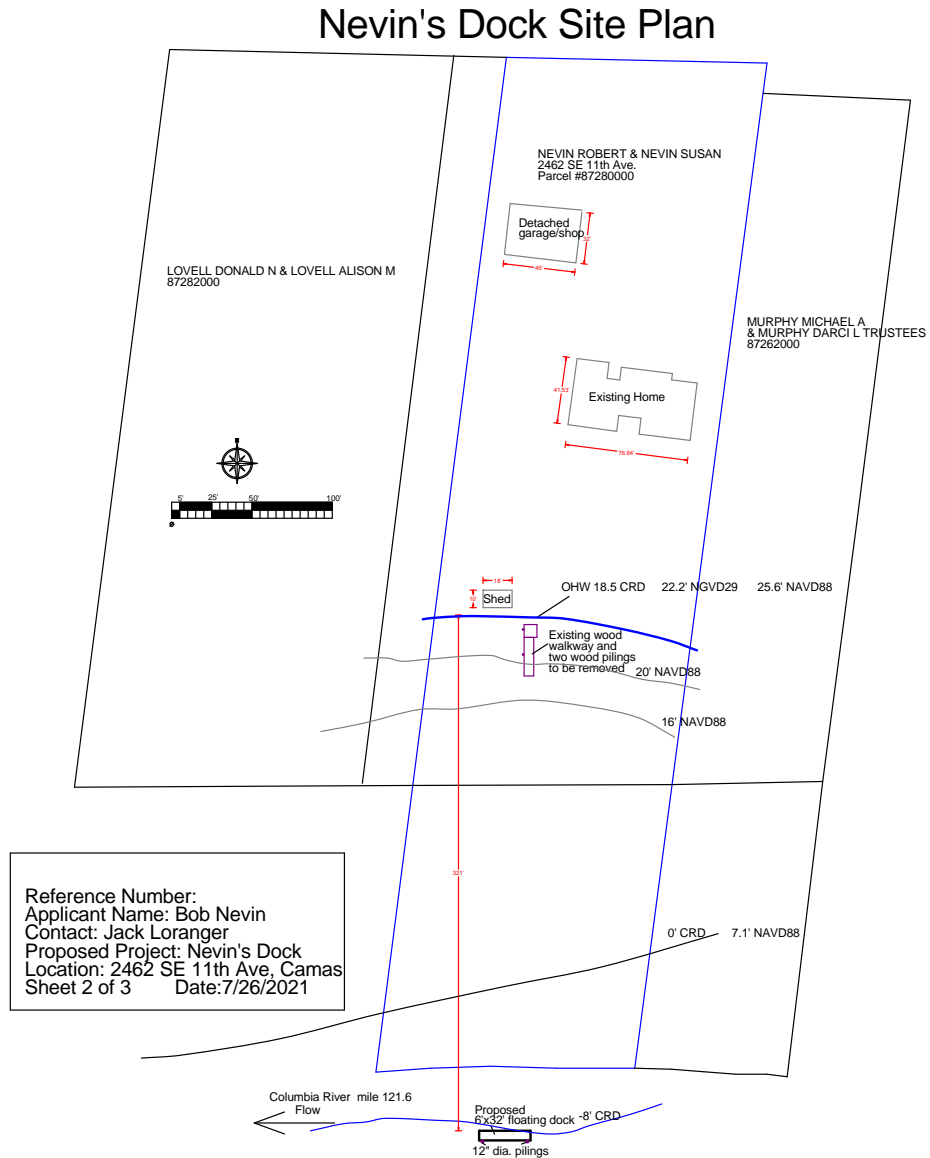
Site plan for Nevin's floating dock off the Columbia River north bank in Camas, Washington.
